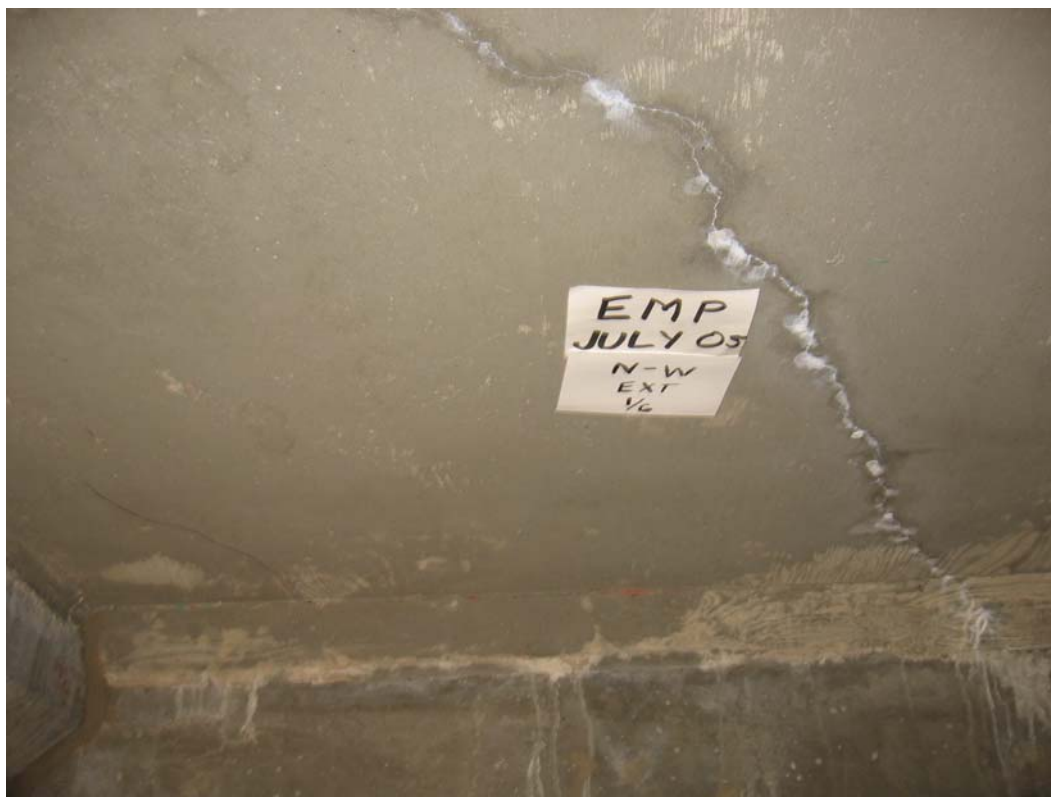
Top-Surface Cracking at South Abutment – Empirical Deck
